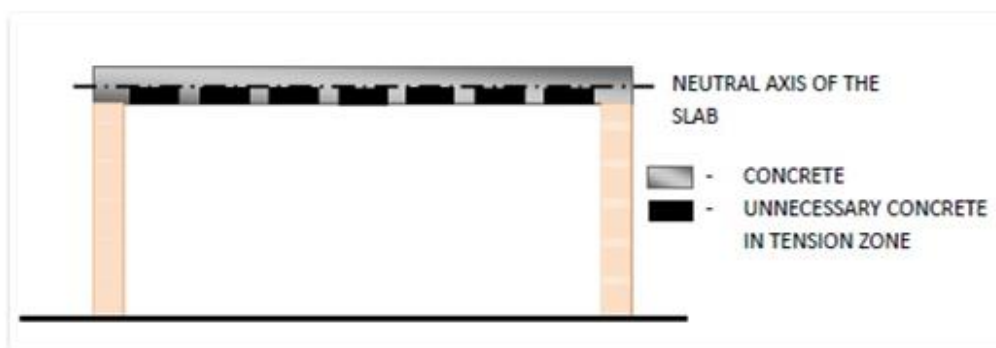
Section of a typical filler slab (Society for Environment Protection, n.d.).
